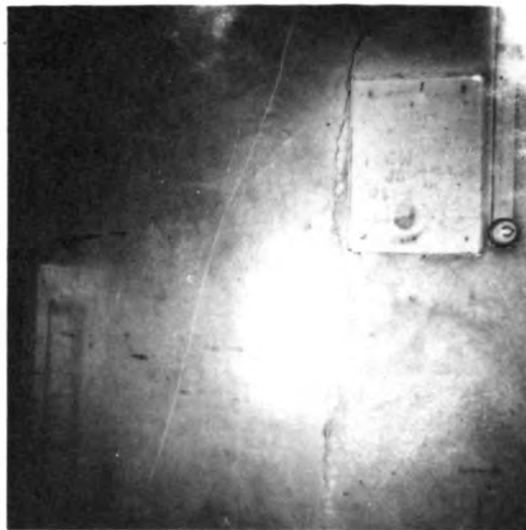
The crack in the wall indicates the prior location of the original prop room. (The description of this prop room is located on page 44)
